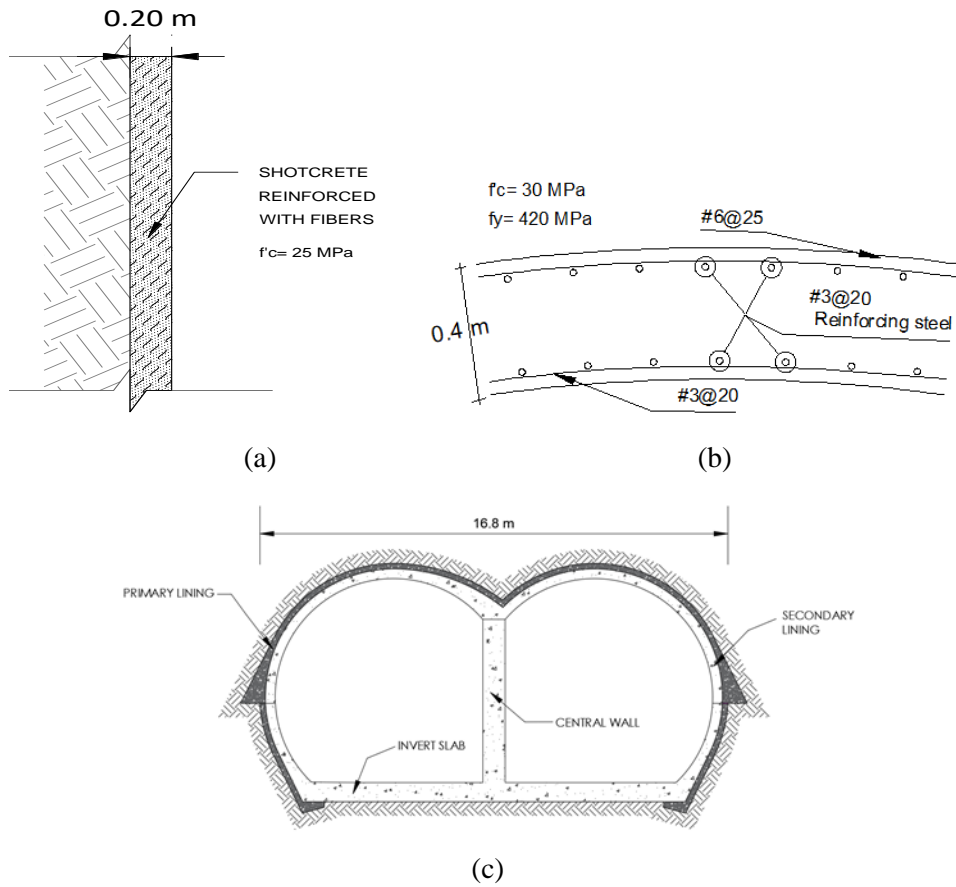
(a) Tunnel cross section, (b) primary lining, and (c) secondary lining
